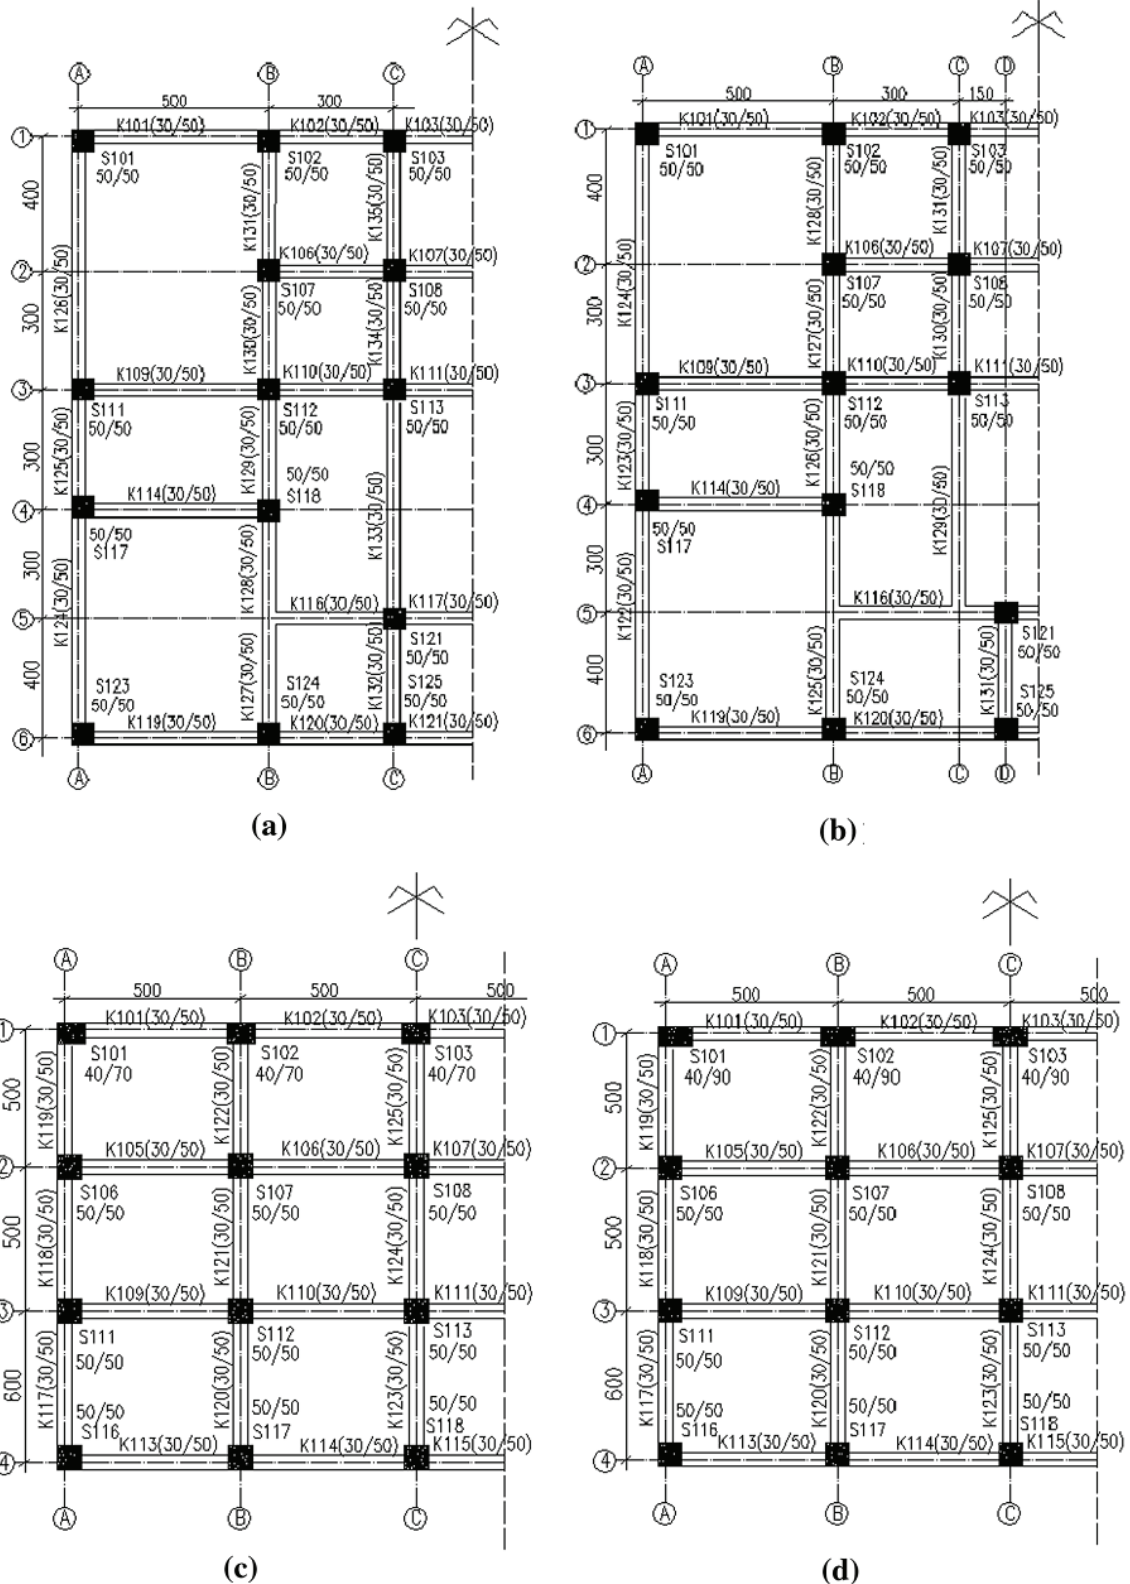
Typical floor plans of considered buildings a) building 1 b) building 2 c) building 3 d) building 4 (Source: Arslan et al., 2018)
